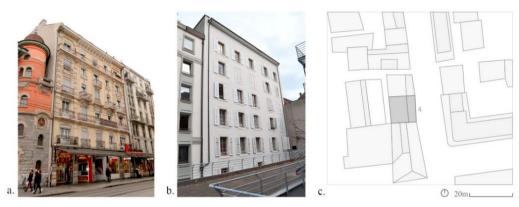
(a) East facade; (b) West facade; (c) Situation plan
